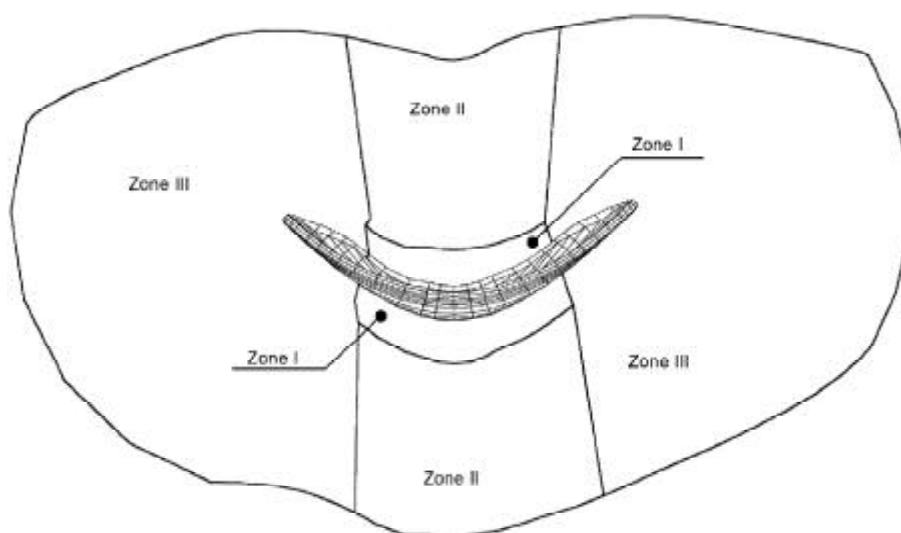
General view of the foundation geotechnical zones for Shahid-Rajaei dam.
